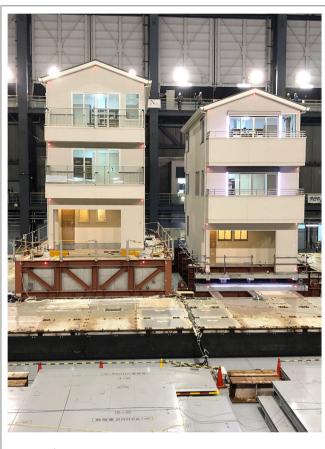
| Full-scale test of two wooden houses at E-Defense.
